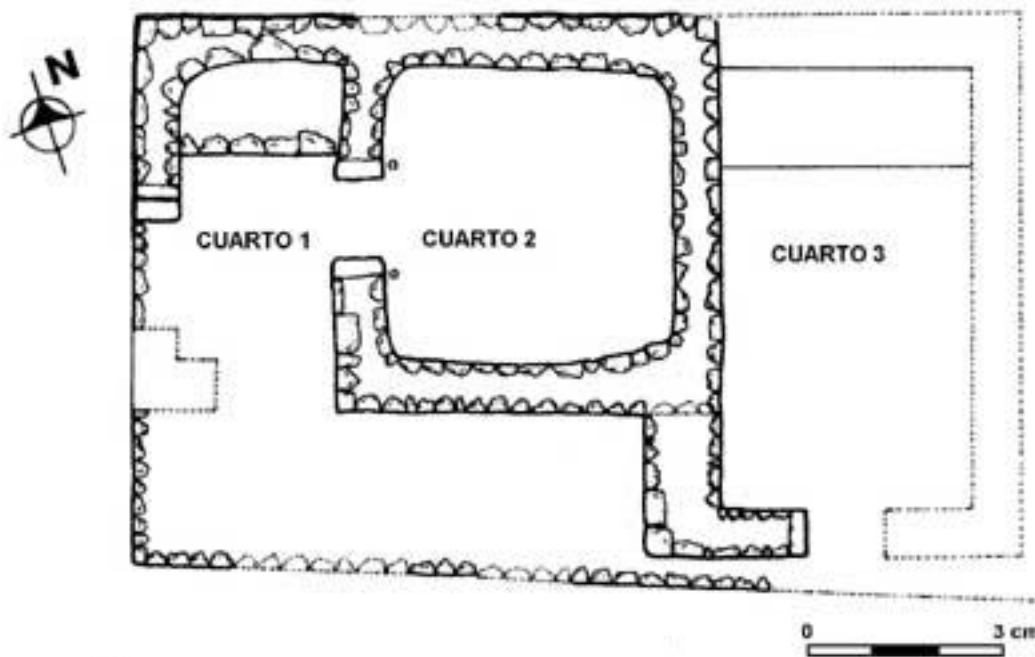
Floor plan of Substructure 5C4-I, with rooms 1-3.
